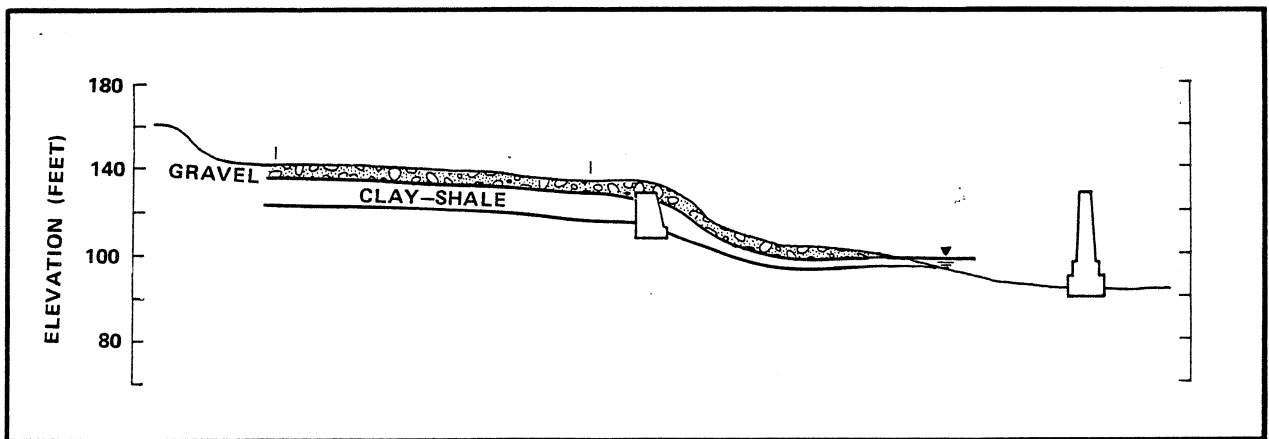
SMITH BRIDGE – CROSS SECTION
